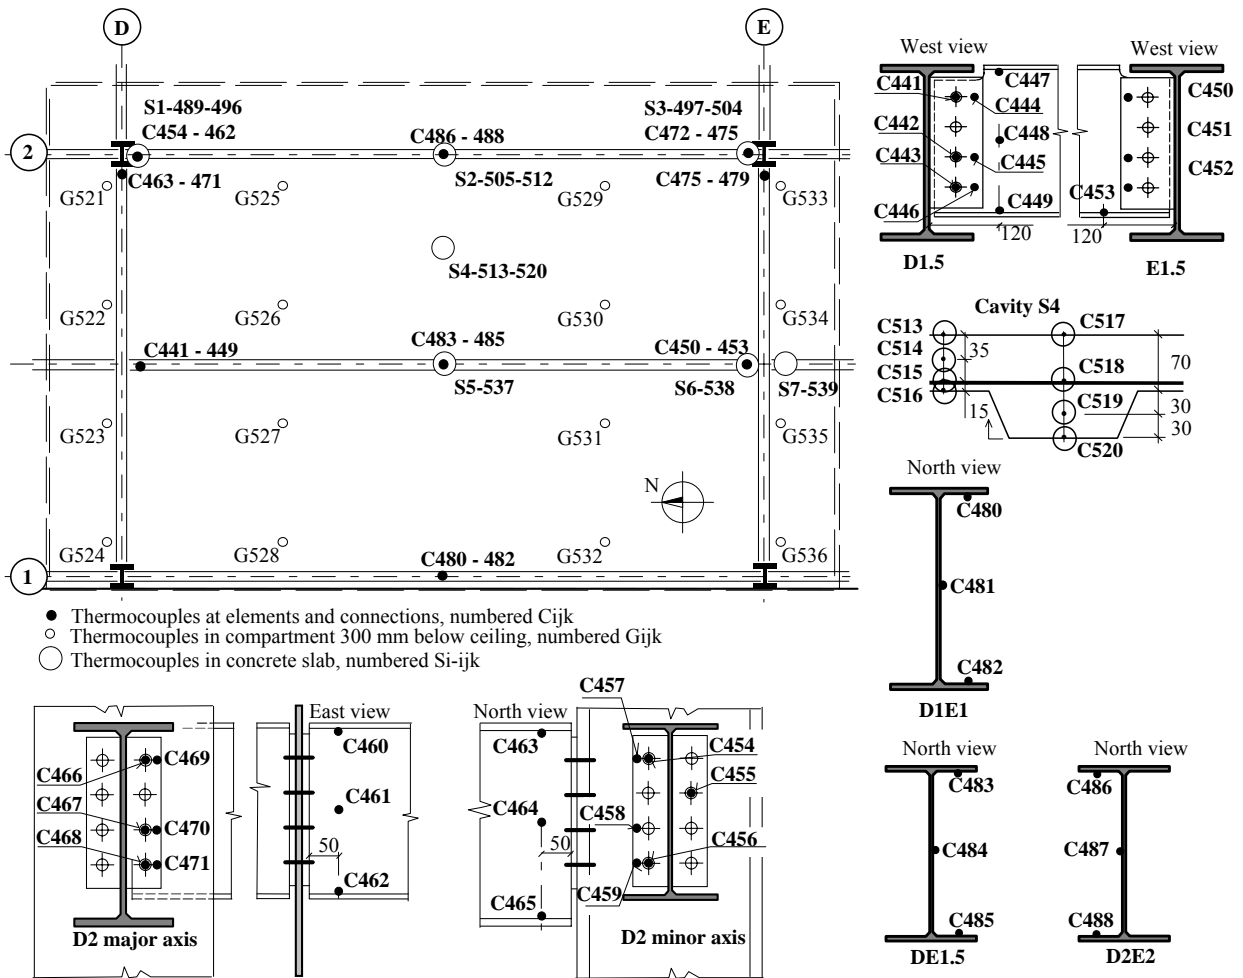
Location of thermocouples in the compartment below the ceiling and on steel structure
